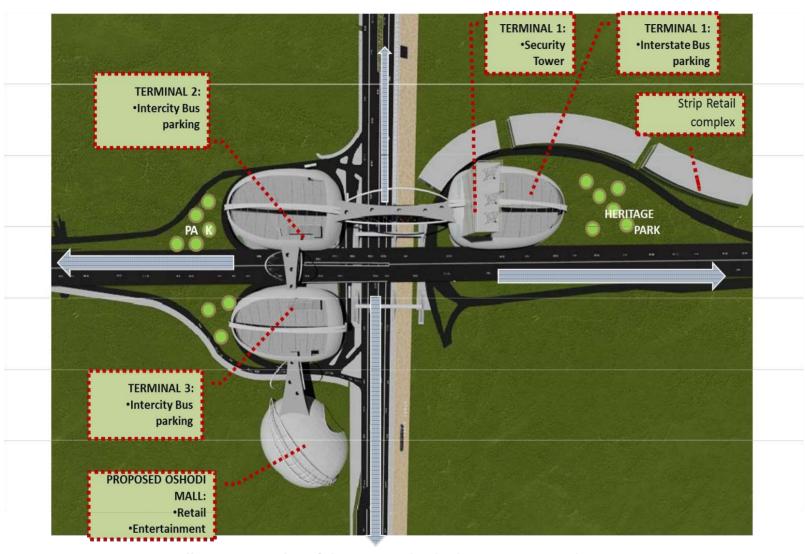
Overall Site Layout Plan of the Proposed Oshodi Transport Interchange Project
